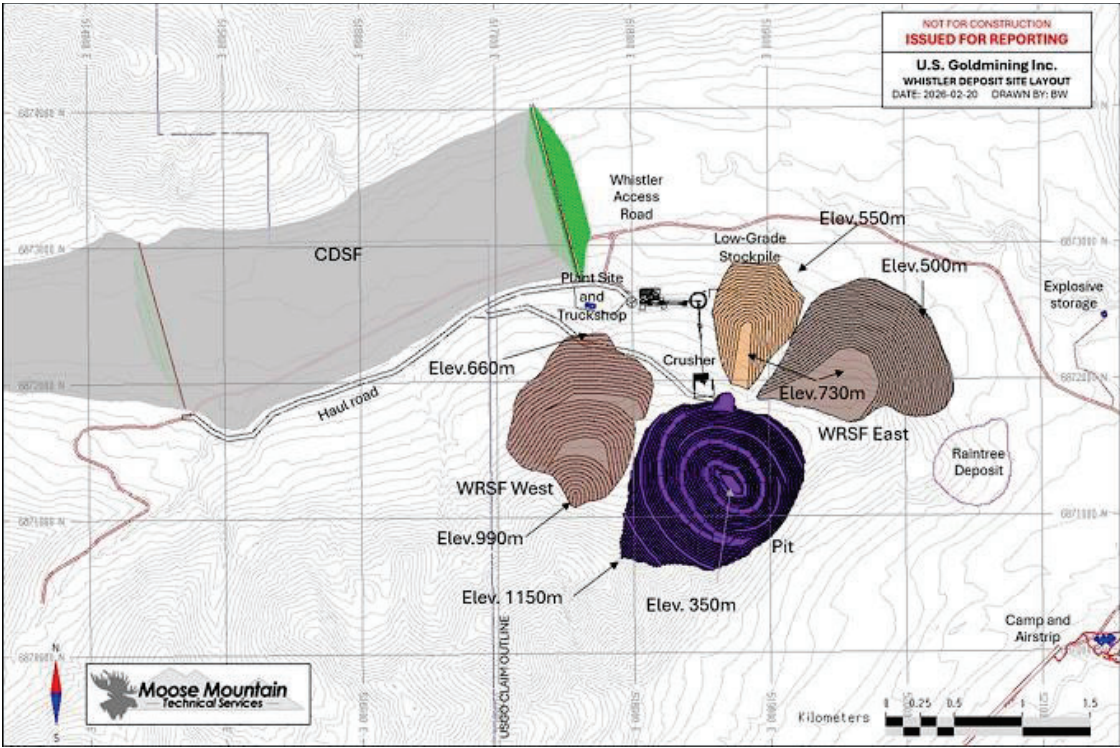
Whistler Project preliminary mine area general arrangement site (source: S-K 1300 Report, 2026 Initial Assessment study).
